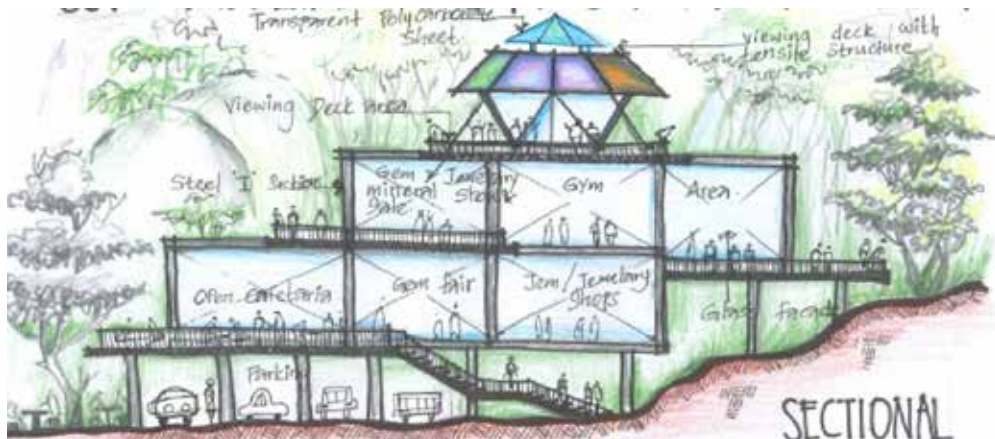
Cross Section - Proposed Nivithigala Development Plan
